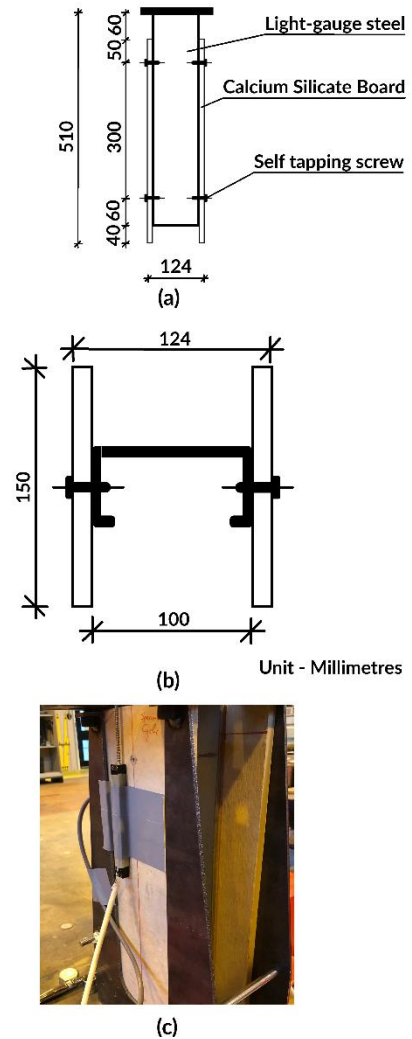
Push-out experiment: (a) specimen elevation view, (b) specimen top view, (c) set-up
